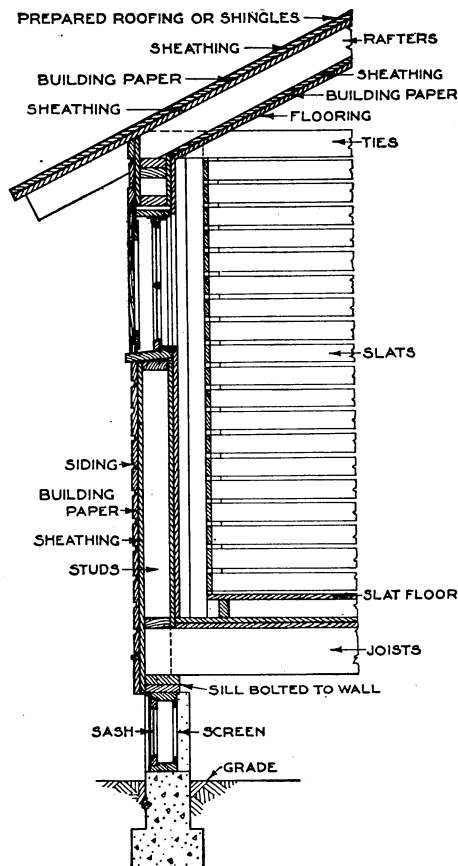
Details of the foundation, floor, wall, and roof construction of a sweet-potato storage house
